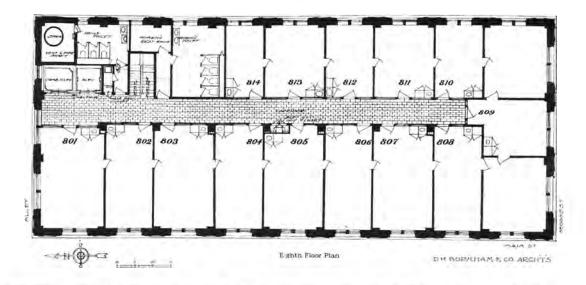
Eighth story plan in June 1910 promotional booklet (Putnam Trust collection).
